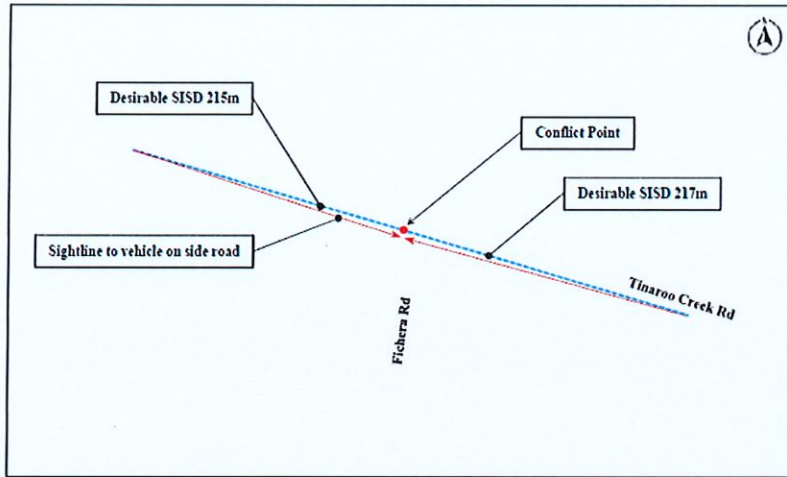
Tinaroo Creek Road/Fichera Road Intersection - SISD Assessment
